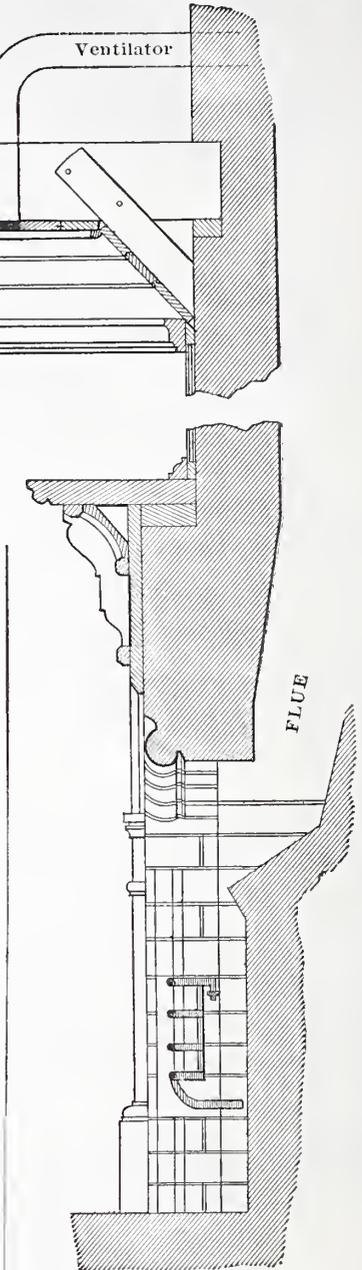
Vertical Section Through Fire-place.—Scale, 3/4 Inch to the Foot.
